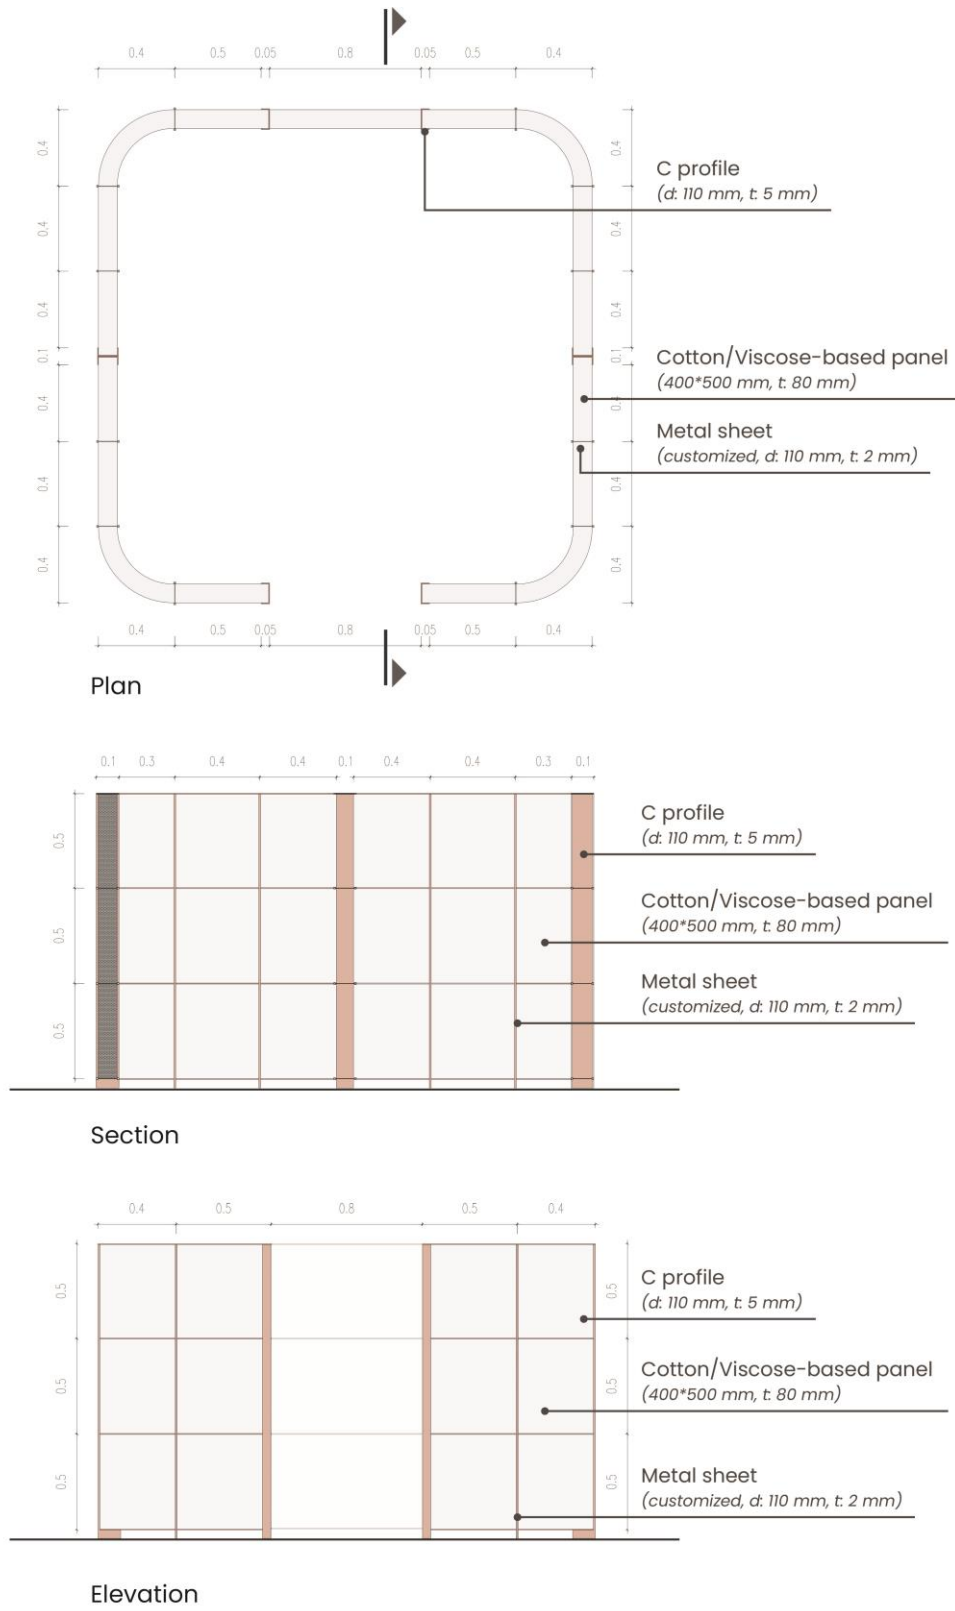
Plan, section, and elevation views of the semi-closed area (Drawn by the author)
